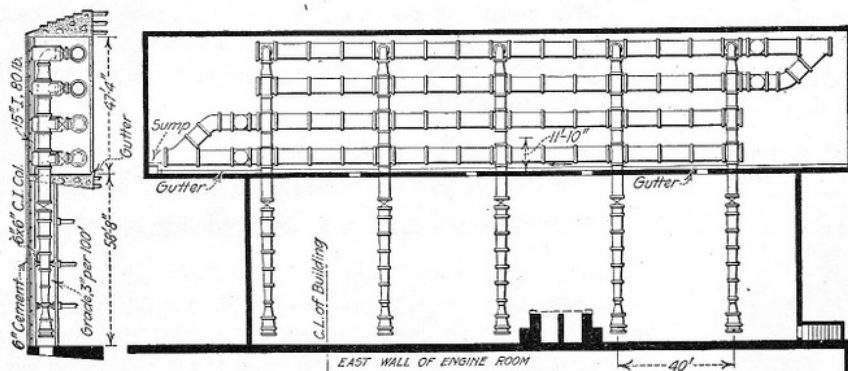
PLAN AND SECTION OF VENTURI AND VALVE ROOM
